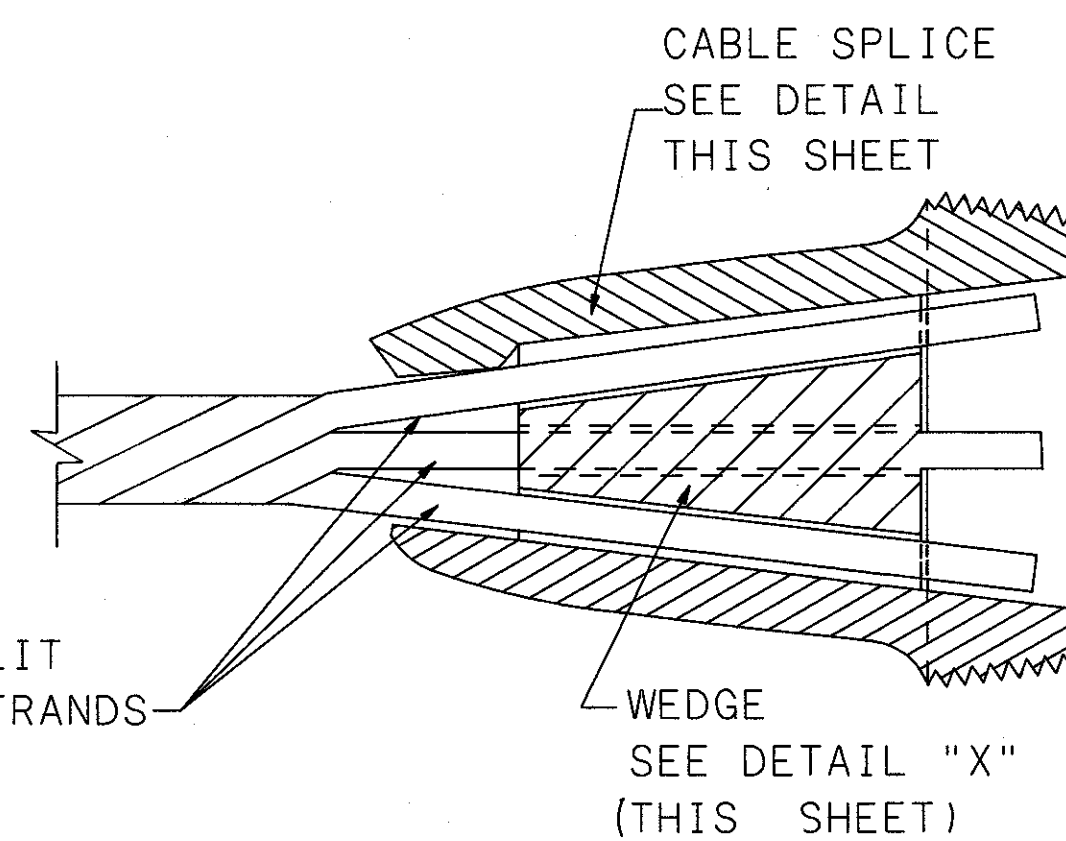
DETAIL "K" CABLE END ASSEMBLY ROD CONNECTION TO BREAKAWAY ANCHOR ANGLE
